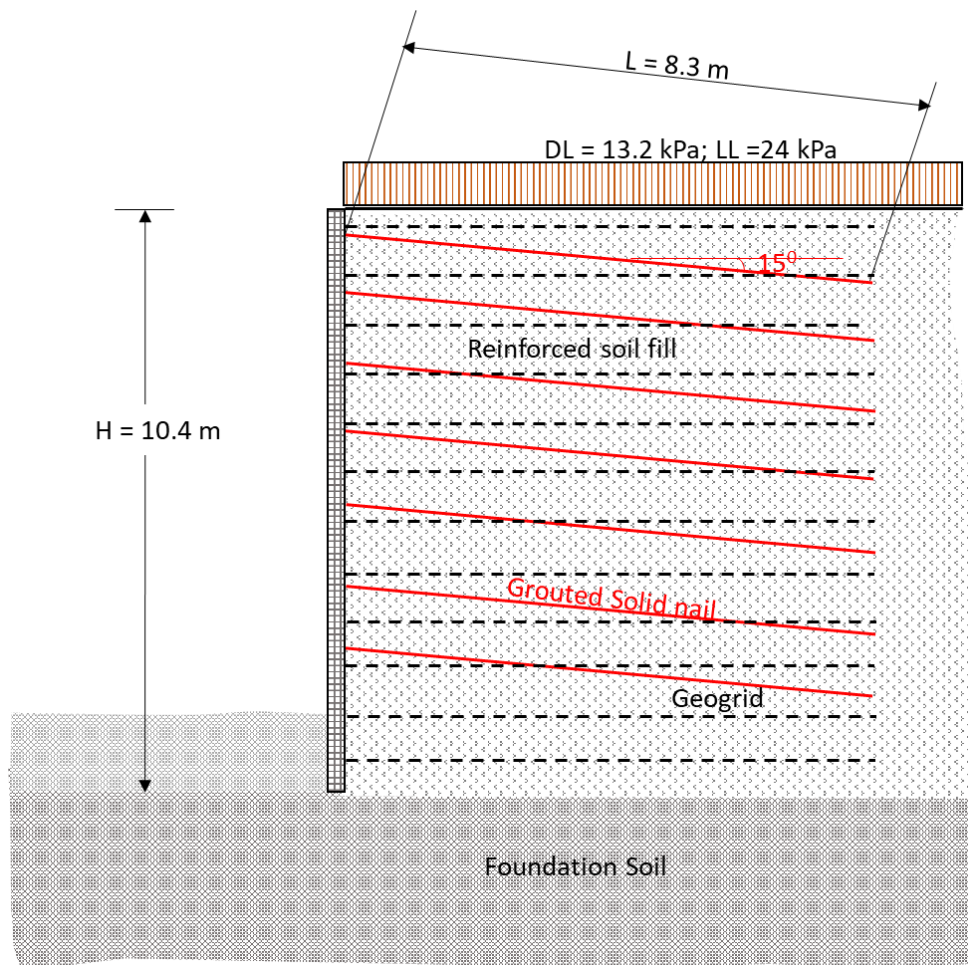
Figure IIB Schematic of GRS wall with grouted soil nail system depicting geometry
